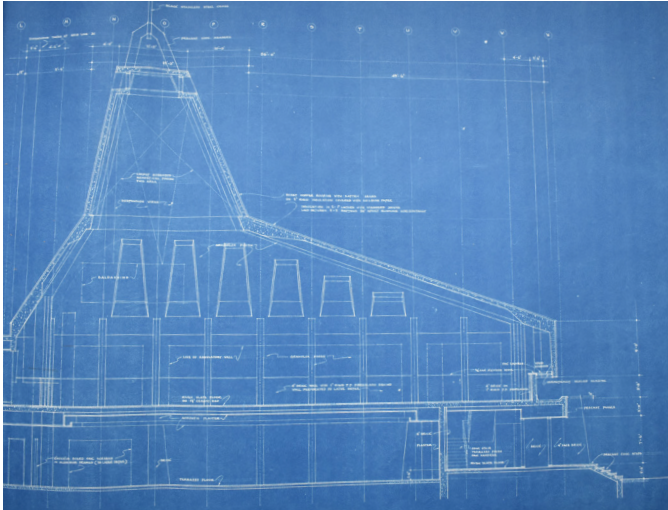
Section at Building A showing continuous concrete roof structure (T. V. Murray, 1963).
